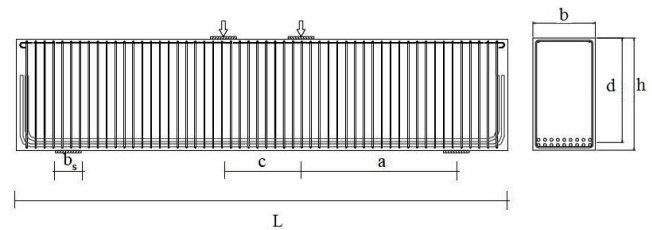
Scheme of the dimensions and assembly of the tested samples (Salamy *et al.* 2005)
